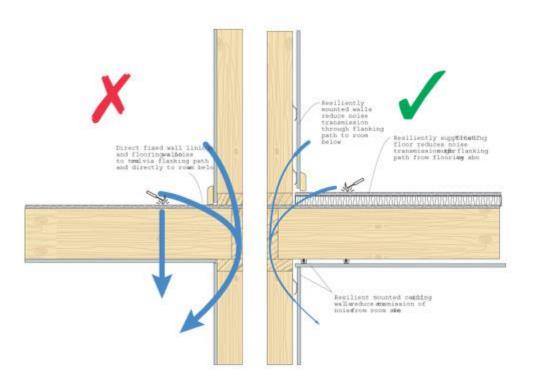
Acoustic isolated floor and ceiling system for timber frame substructure
